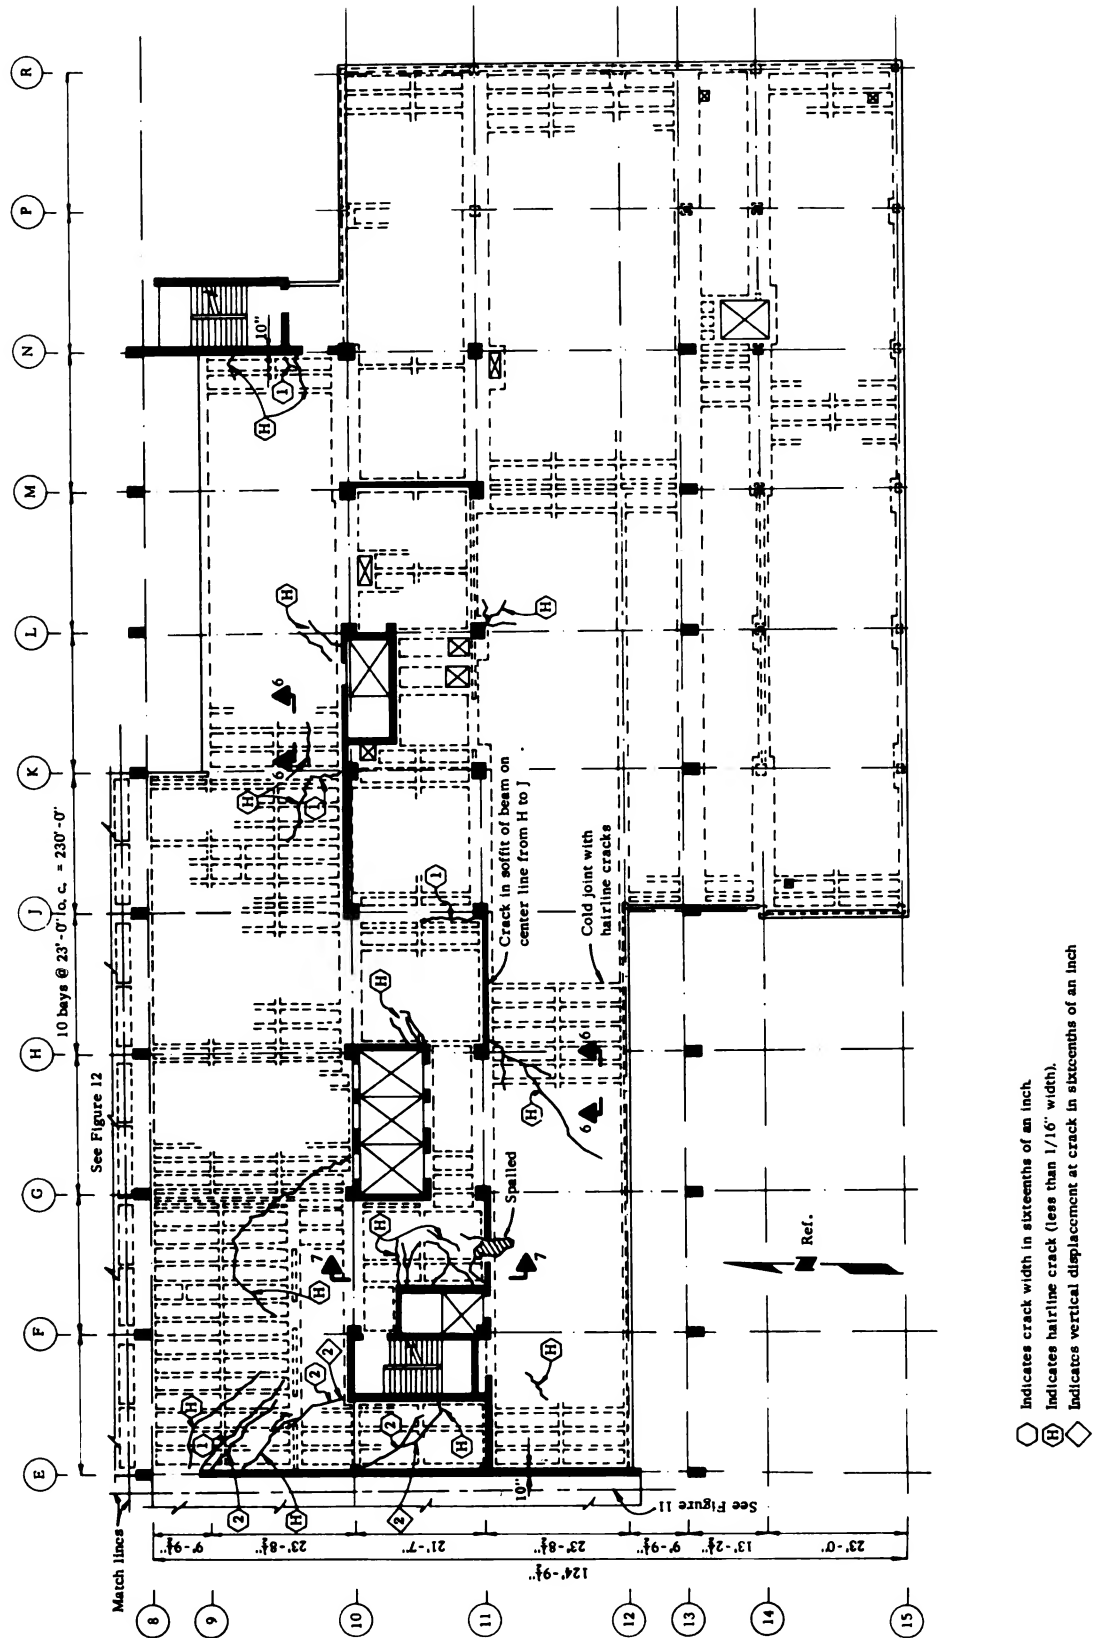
Holy Cross Hospital. Second-floor framing plan (7-story tower and east wing).
